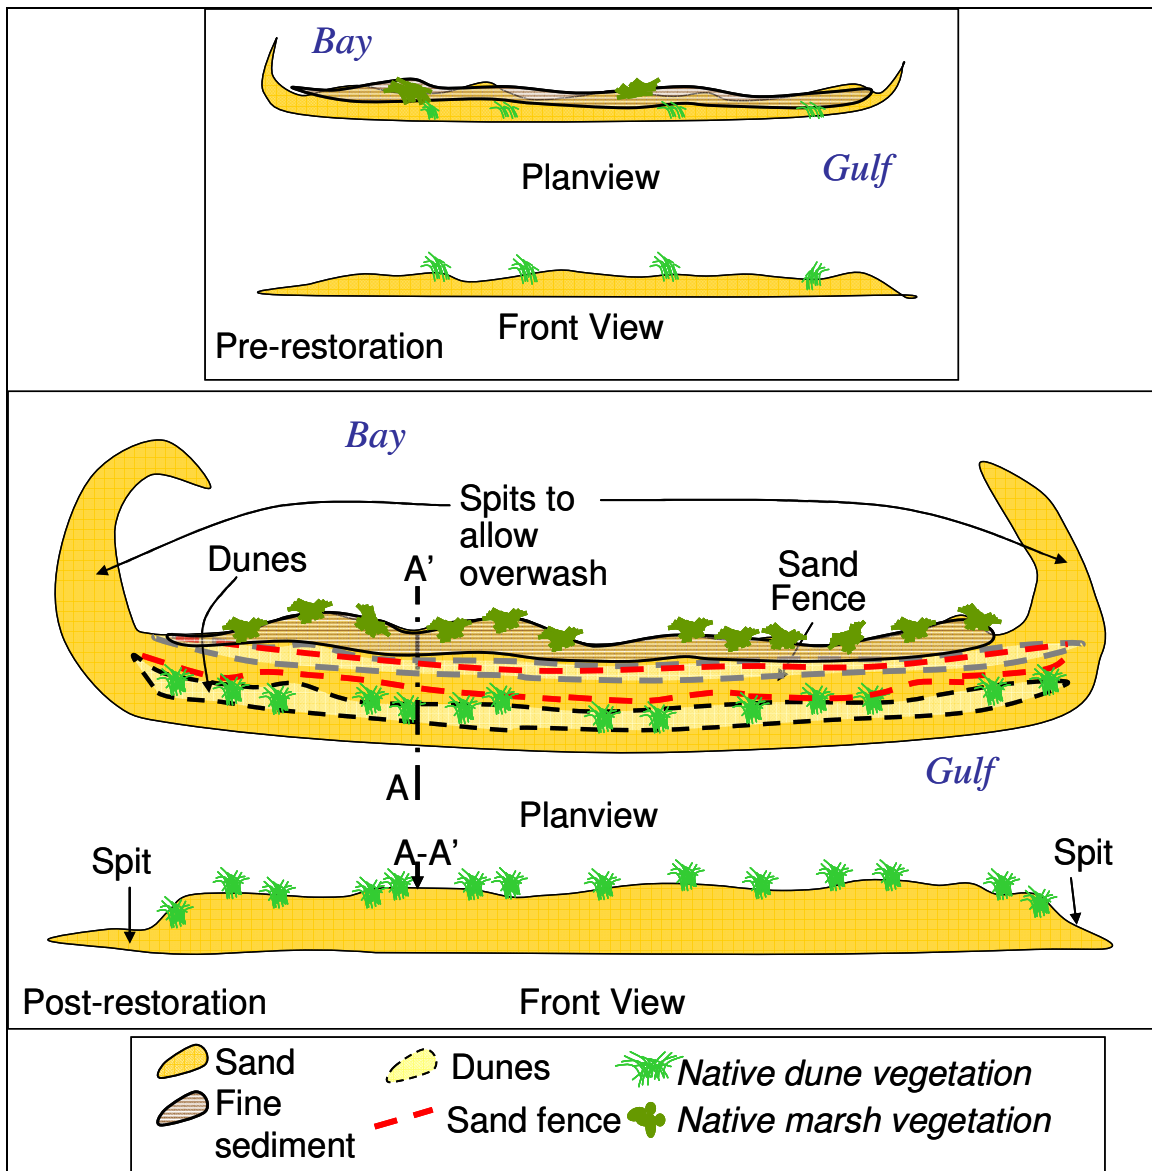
Conceptual design of large-scale stable restoration: Plan and front views.
